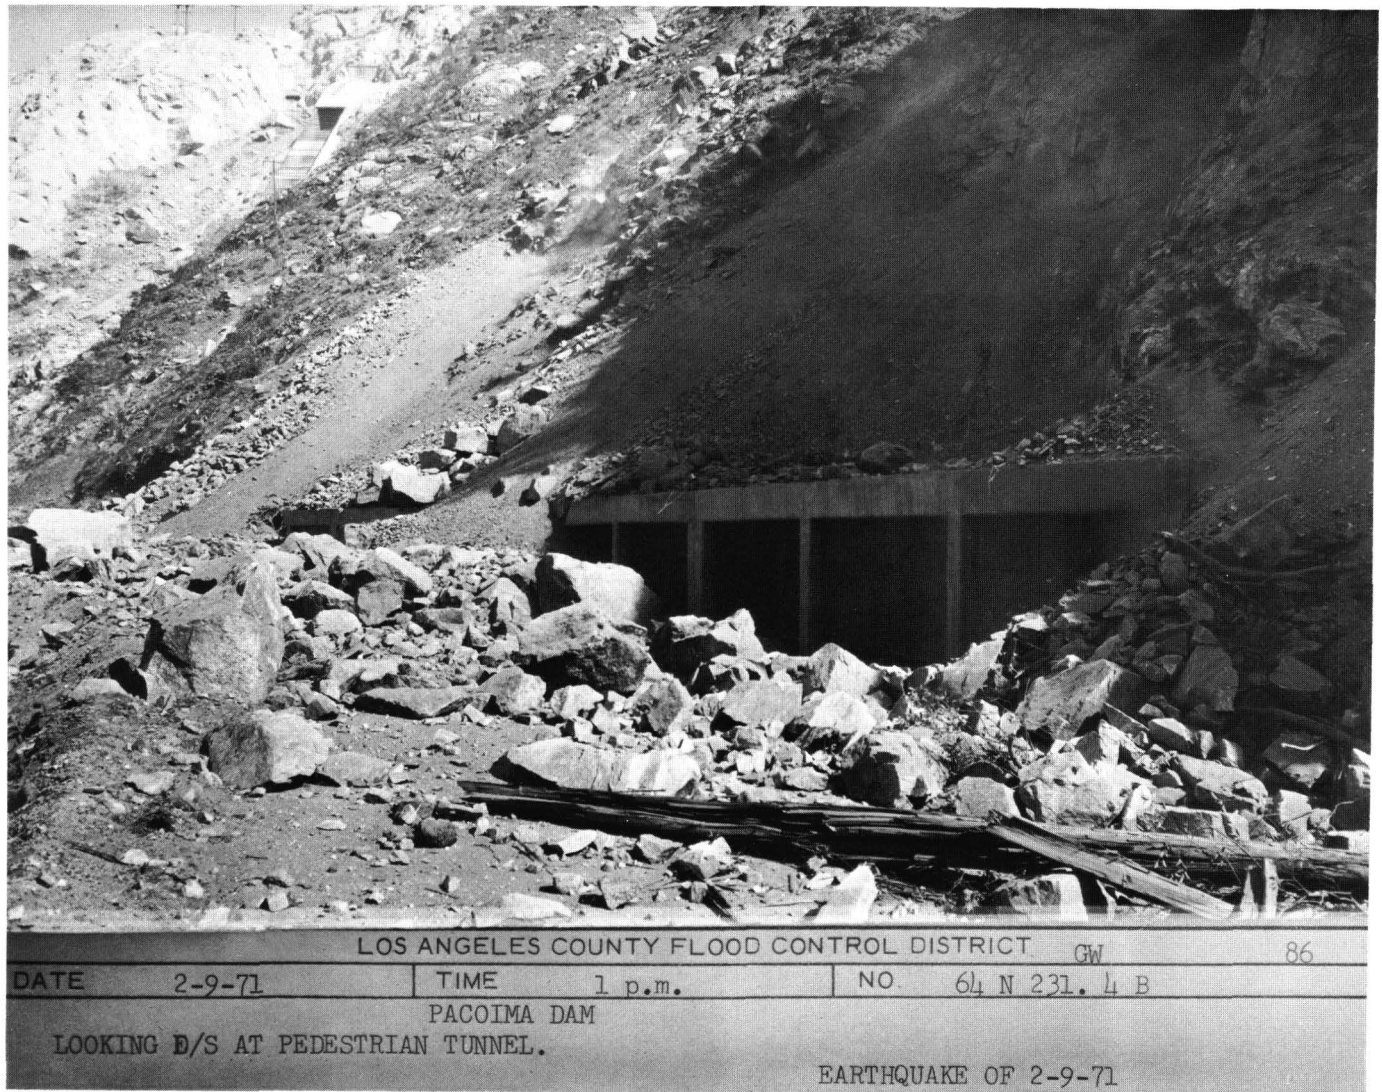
Rockslides at west abutment of Pacoima Dam. LACFCD photograph.
